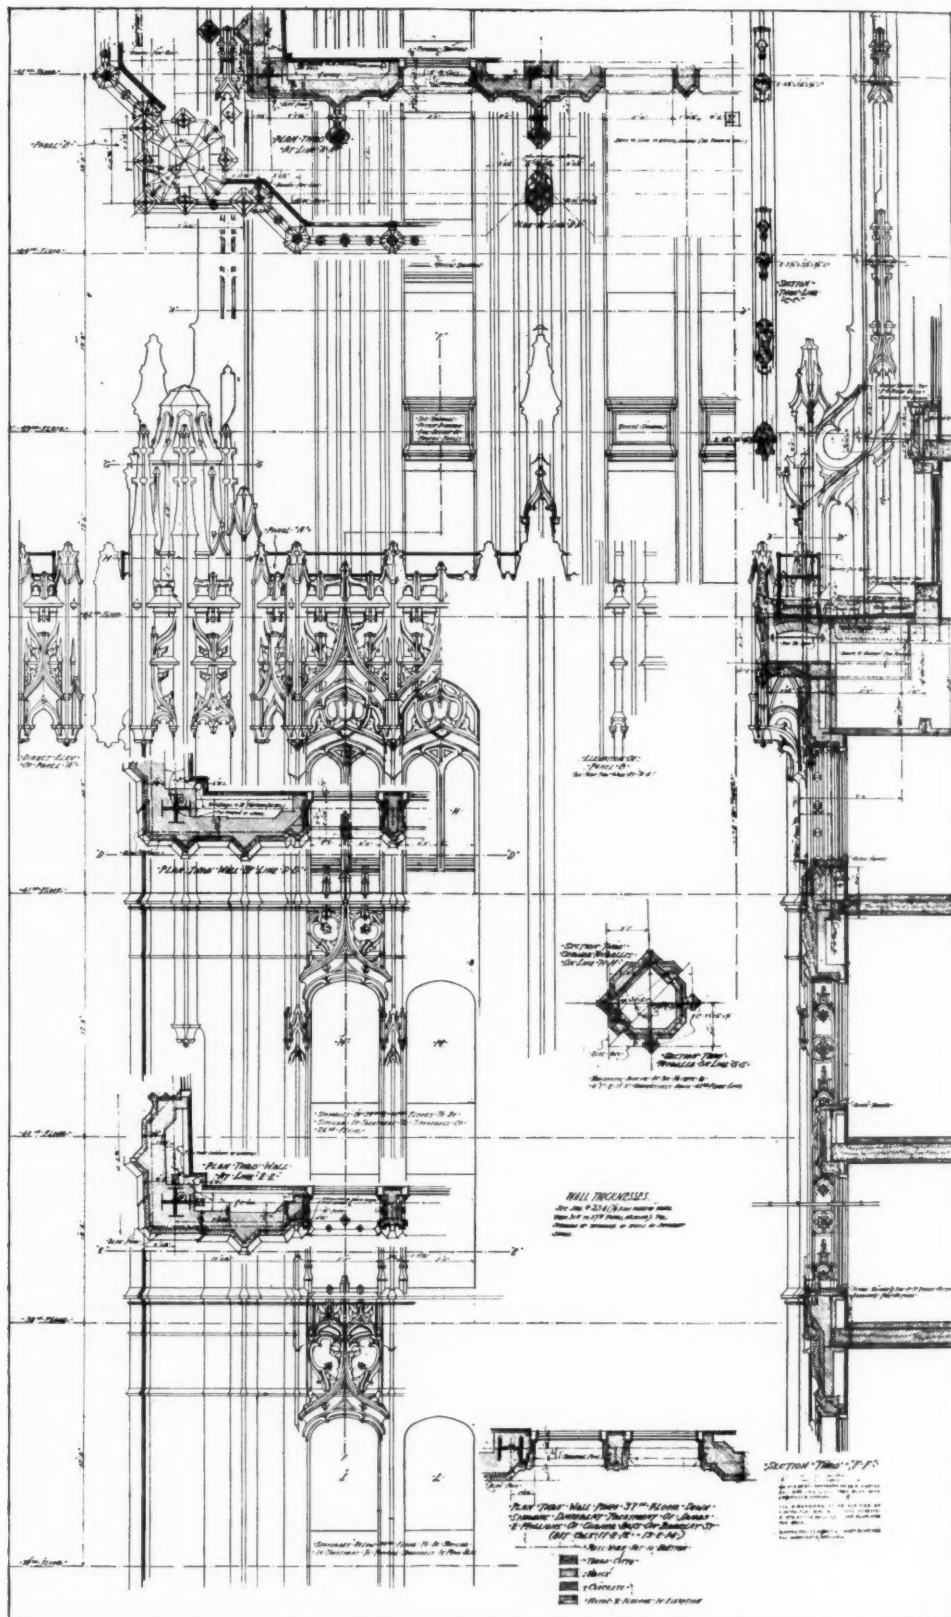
DETAILS OF EXTERIOR TERRA COTTA FROM FORTY-SIXTH FLOOR UP TO ROOF OF TOWER
